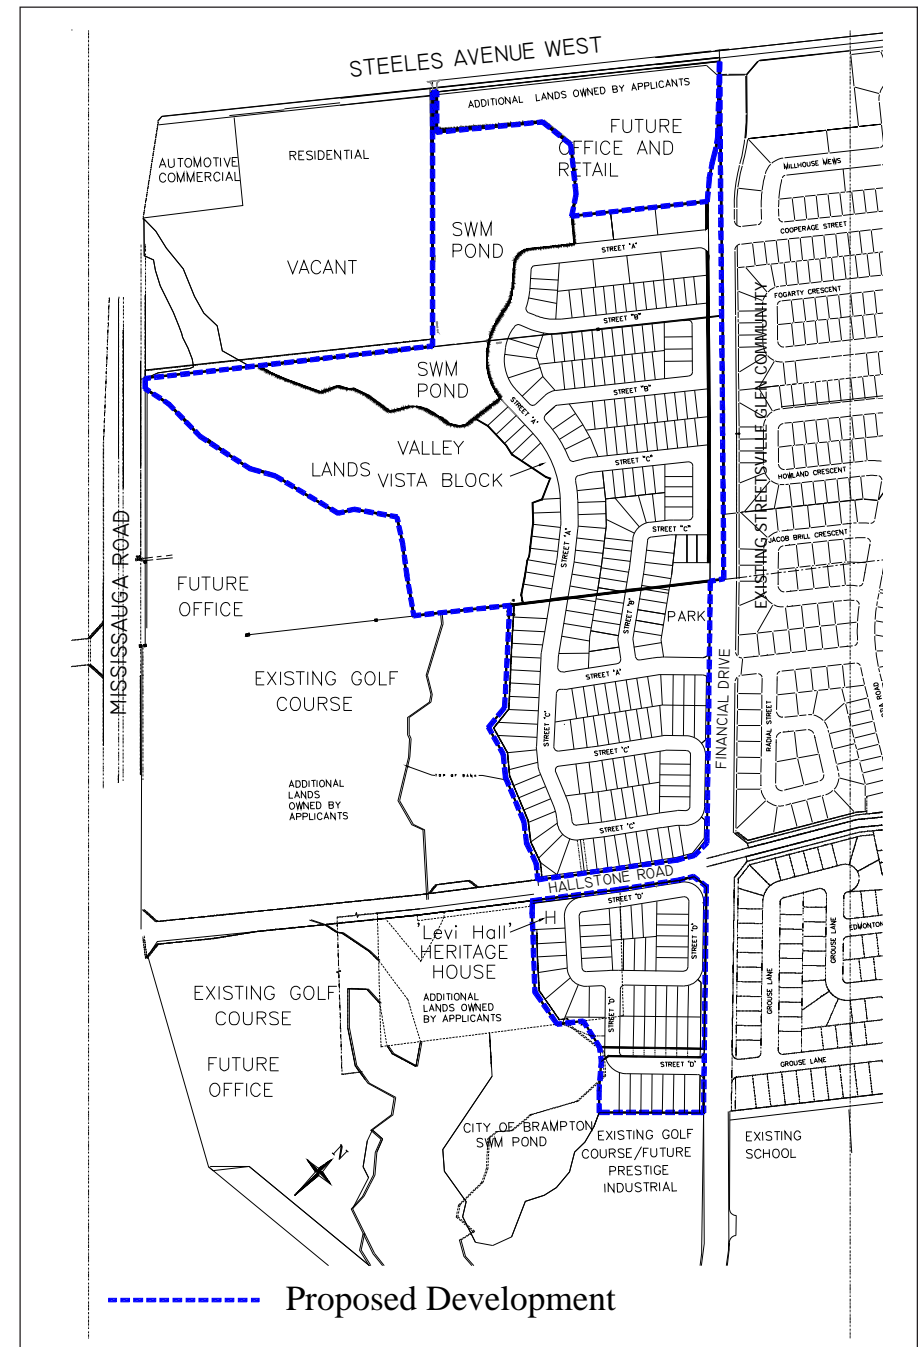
Composite Plan of 'Streetsville Glen West'
